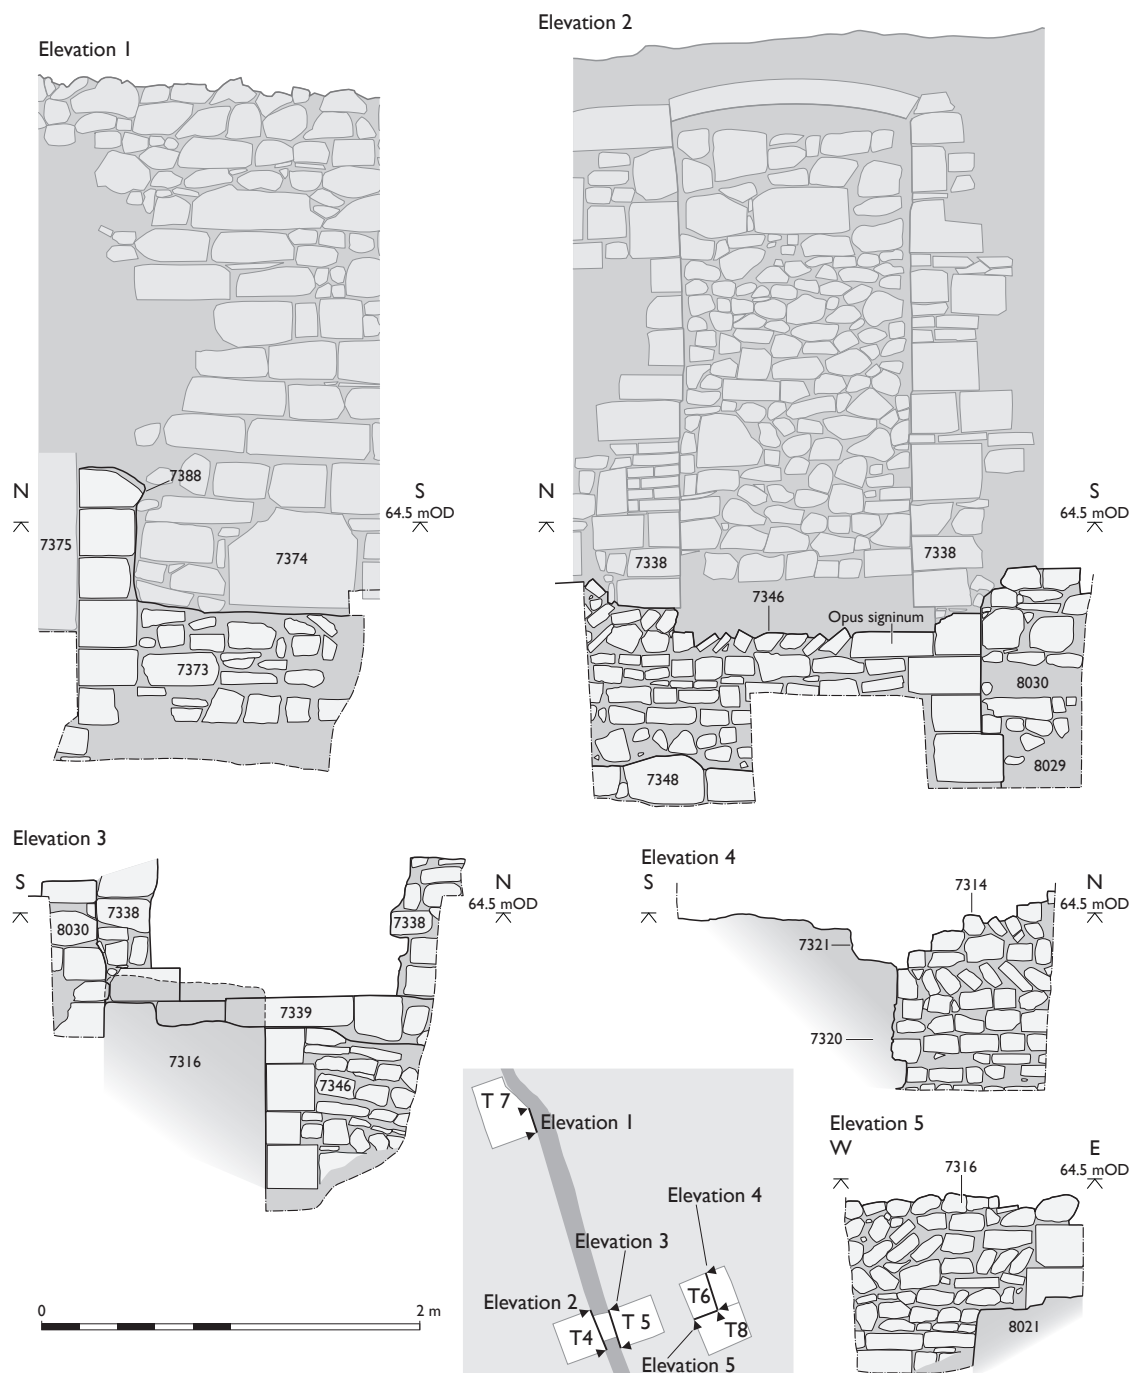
Elevation 1: west face of the garden wall, trench 7, showing the north end of Building 7347; elevation 2: south end of Building 7347 and wall 8030 in relation to the 19th century garden niche, trench 4; elevation 3: east face of Building 7347 and the south door frame and sill of the 19th century entrance, trench 5; elevation 4: east face of wall 7314 and profile of buttress 7320, trench 6; elevation 5: south face of wall 7316, trench 8
